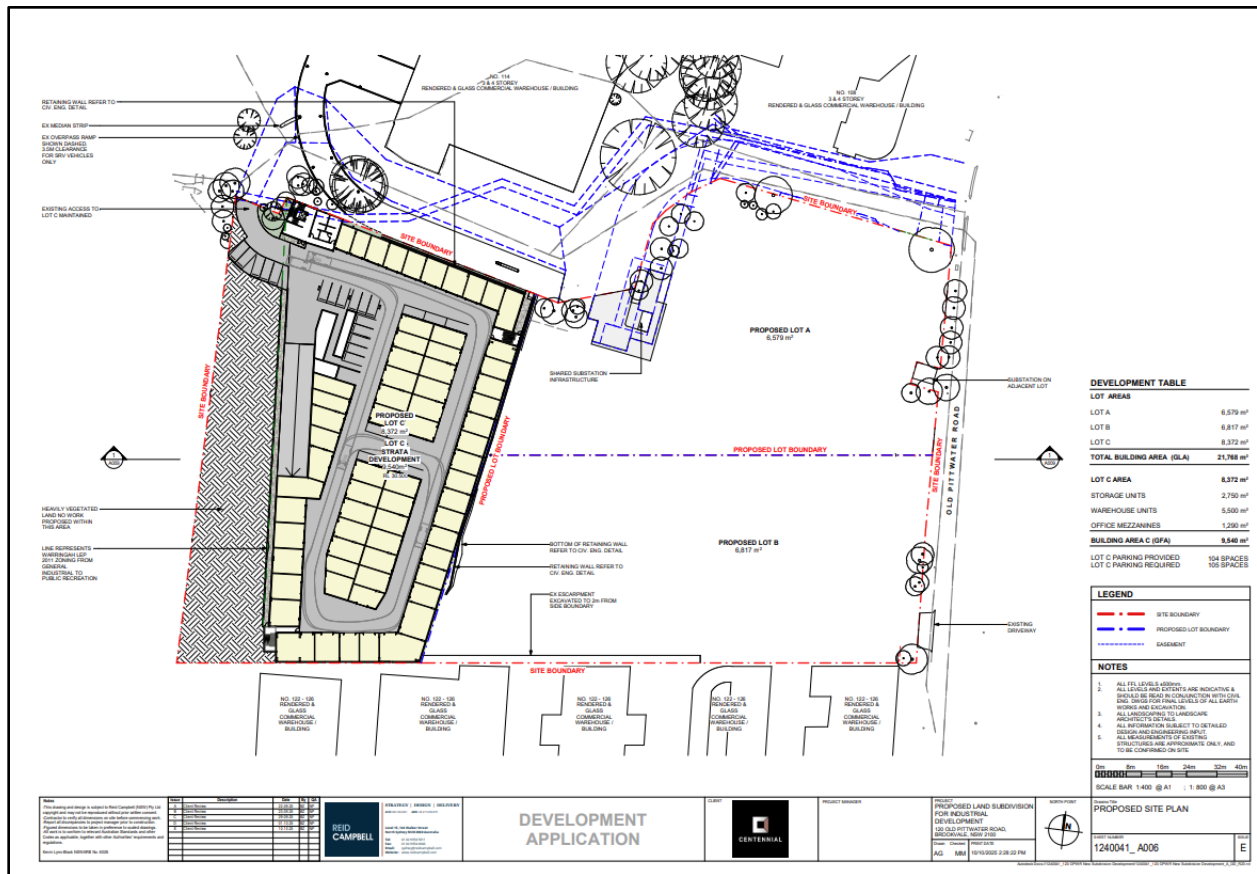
Site Plan (Source: Reid Campbell, 2025)
